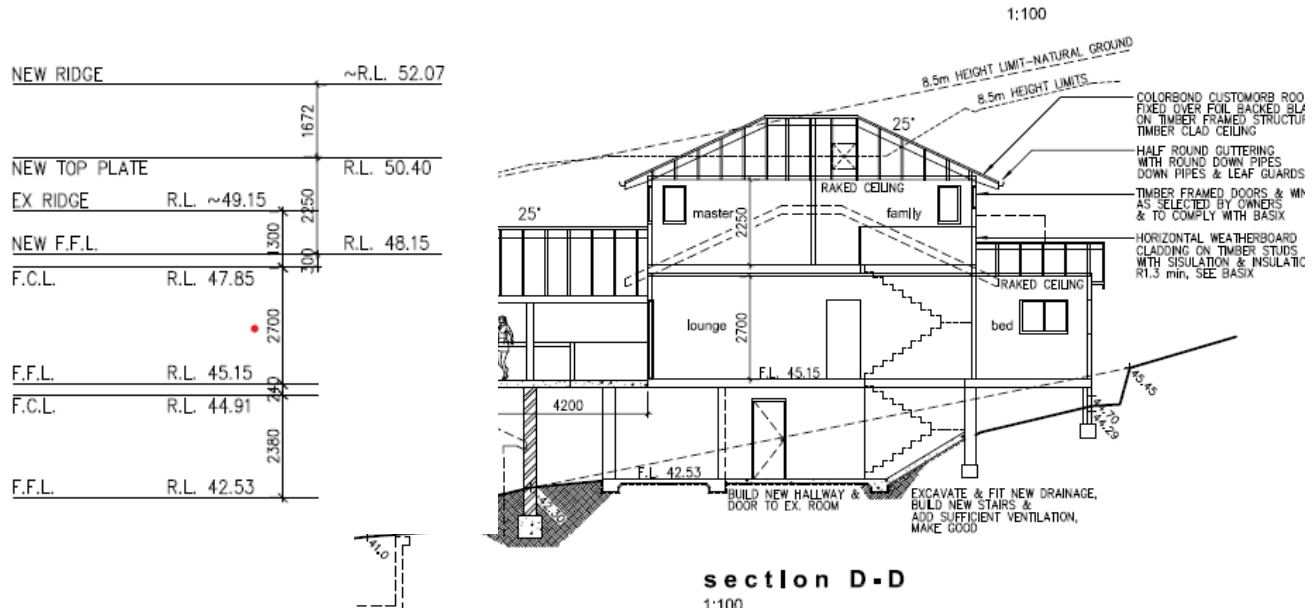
Section extract from plans prepared by AH Design dated April 2025
